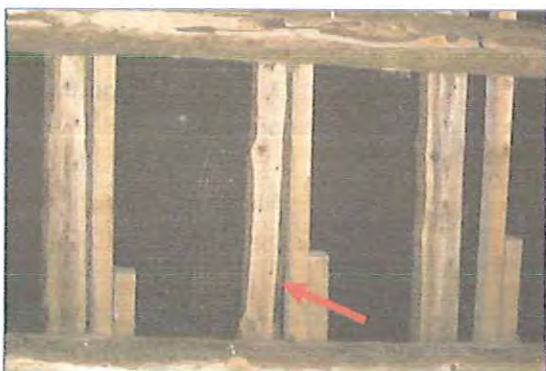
Gap between roofing timbers to unit a (bat droppings found below).
